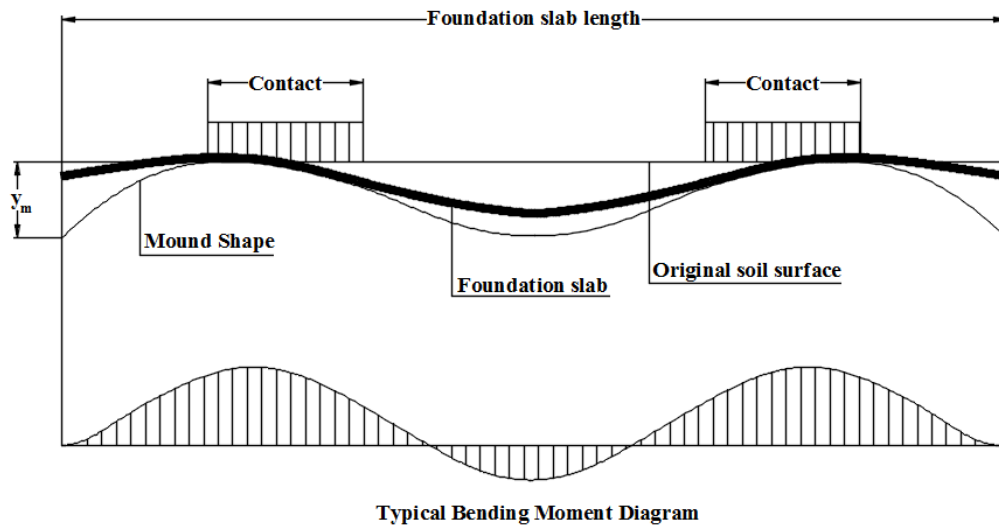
Typical mound shape, footing shape and bending moment for flexible slab foundation with large dimensions in the edge drop scenario.
